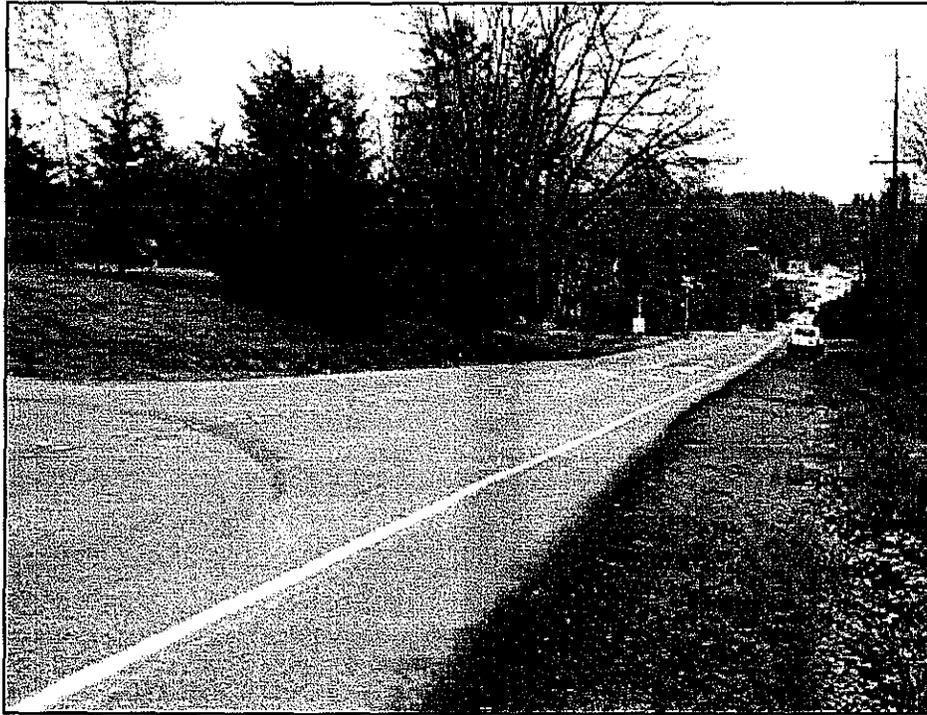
Looking east along NE 145th St (from opposite 138th Ave NE) at project area along north (left) side of the street. Note the rock wall along the north side of the project ditch.
